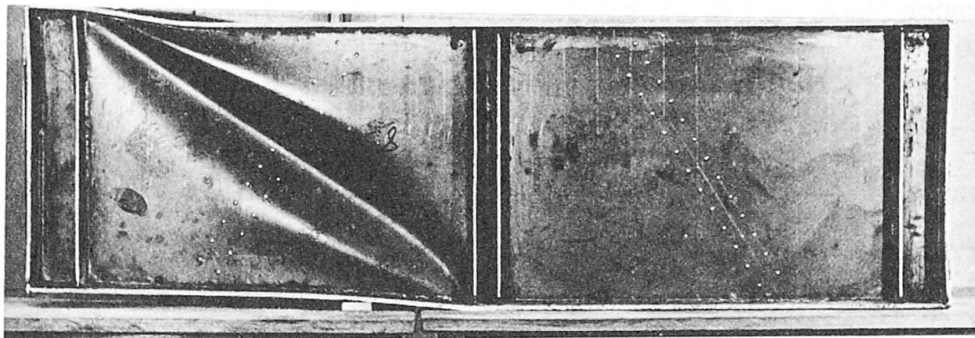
View of a failed girder showing failure sway mechanism
